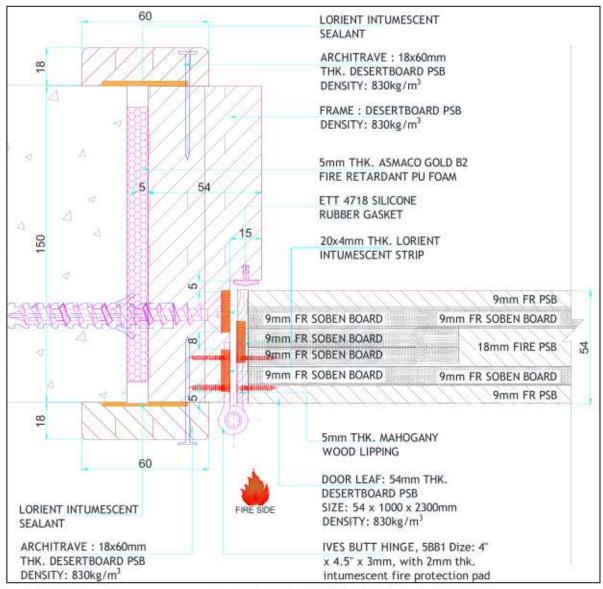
Horizontal section view of the doorset B. (Drawing provided by the test sponsor)
